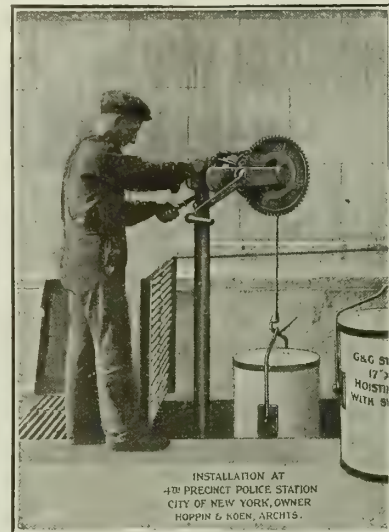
AUTOMATIC GEAR SHIFTING BRAKE DEVICE IN OPERATION
